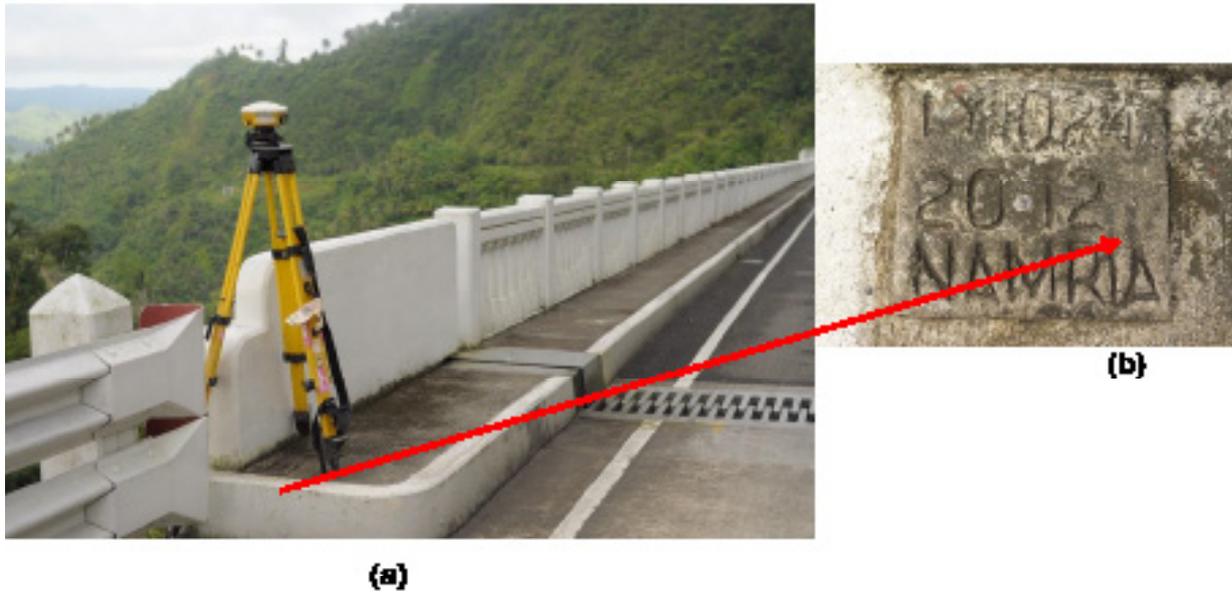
GPS set-up over LY-1024 located at the SE end of the sidewalk of Agas-agas Bridge at KM post 1006 + 972.6 and 4 meters from the road centerline.(a) and NAMRIA reference point LY-1024 (b) as recovered by the field team
